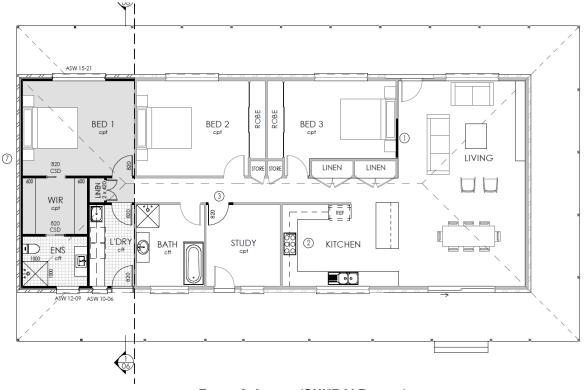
LAYOUT (SUNRAI DESIGNS)
